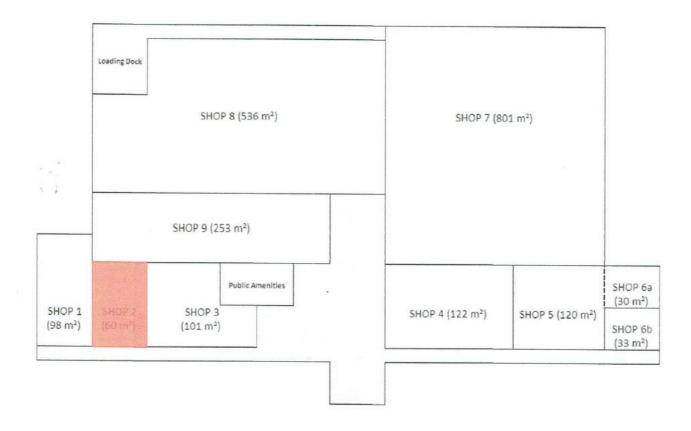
Plan of Town and Country Shopping Centre (Ref: Town and Country Ltd)
